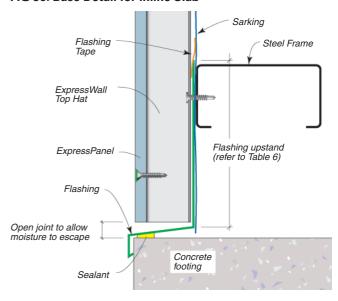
Base Detail Corrosivity Category D - Inline Slab
